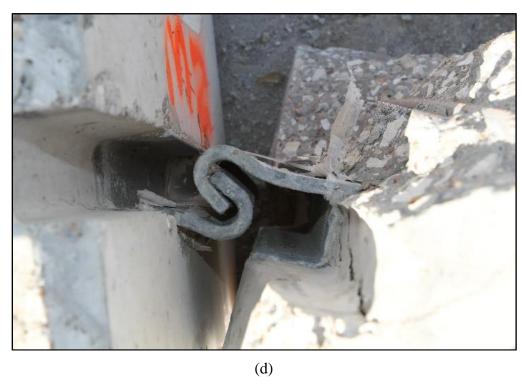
Damaged Portable Concrete Barriers after Test No. 440592-2 (Continued).
